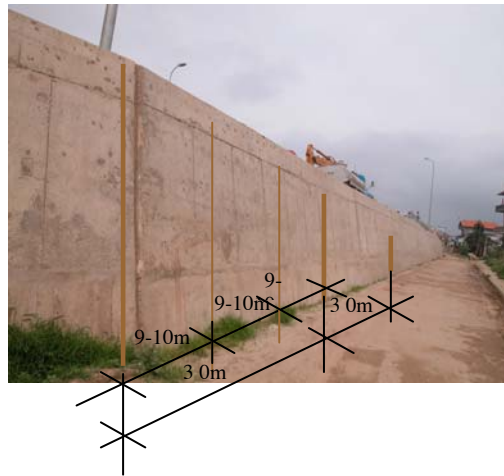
Placing expansion and contraction joints to a concrete road wall in Hanoi
